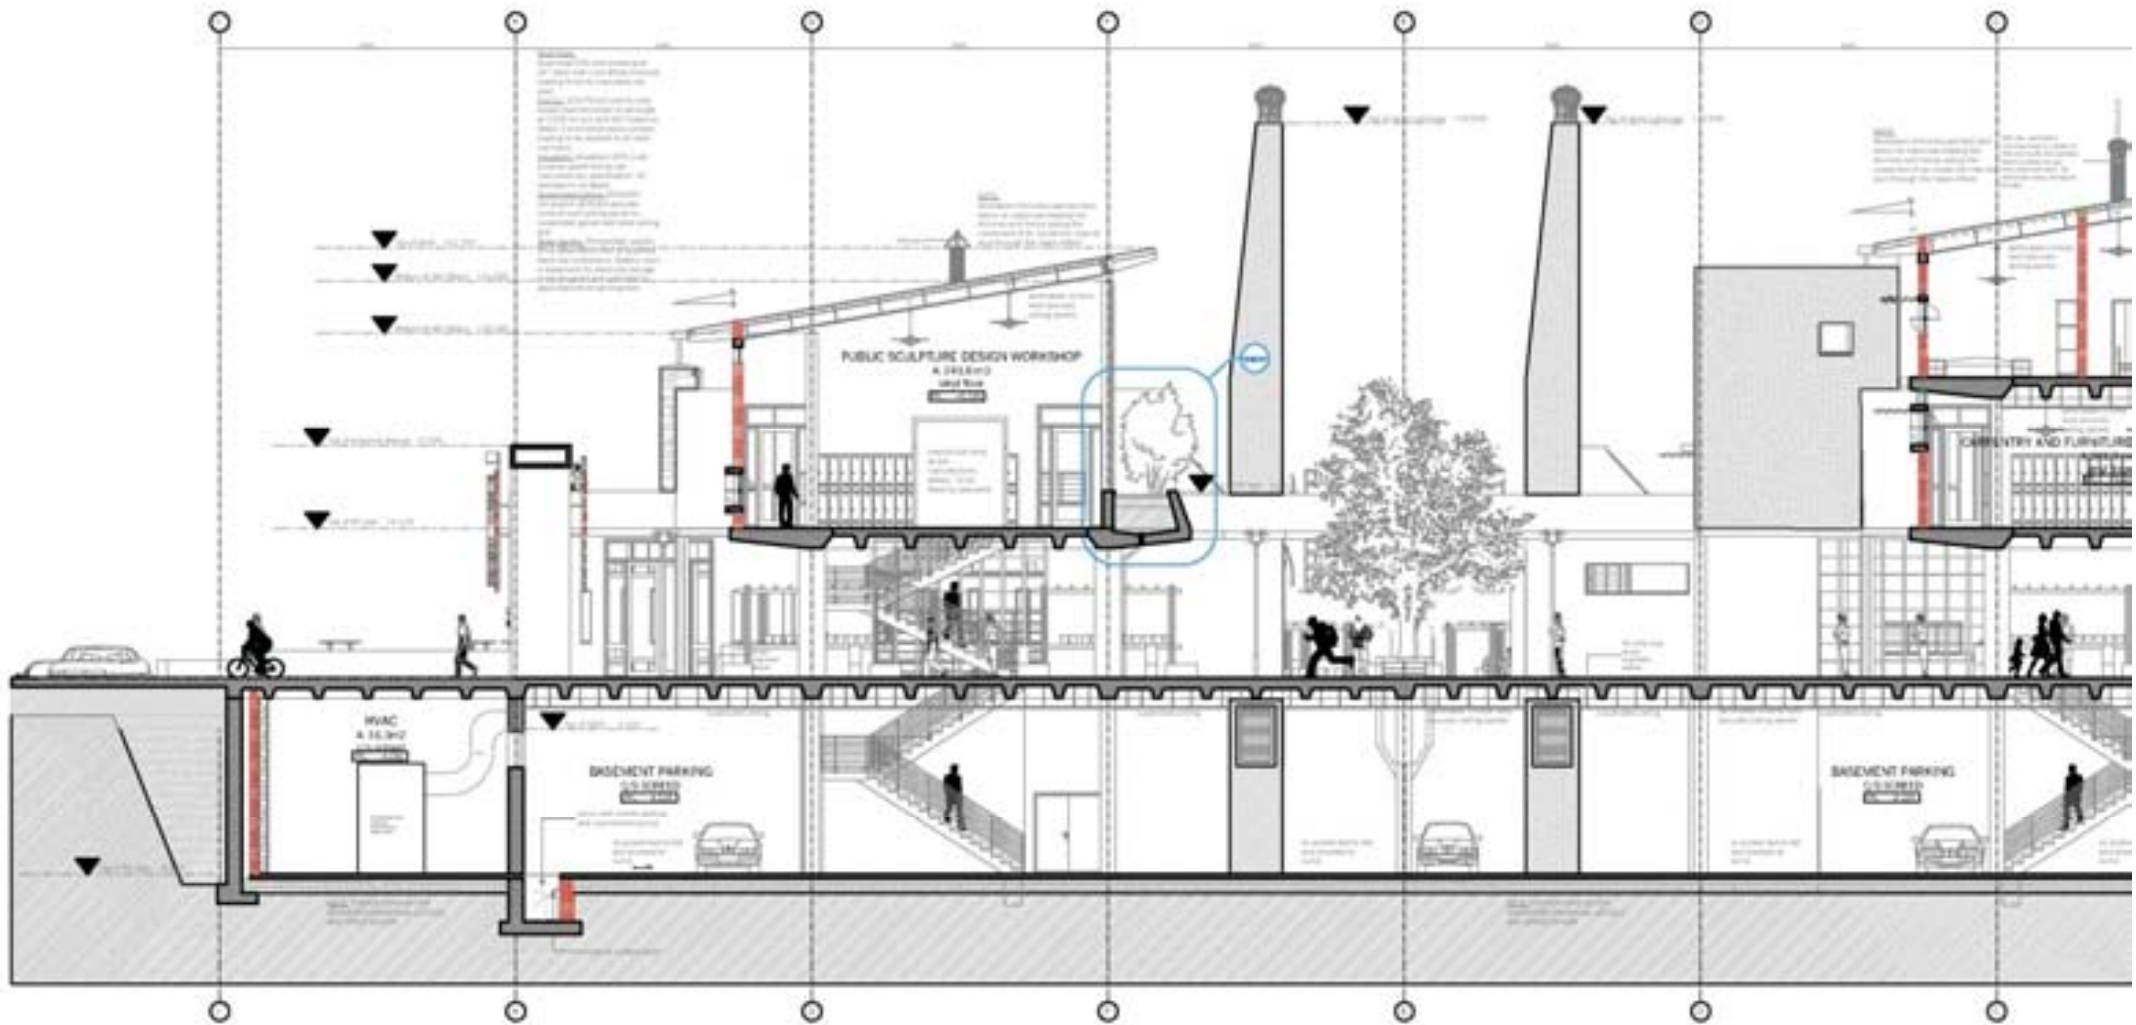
Section A-A. Scale 1:200. (Author, 2009).
